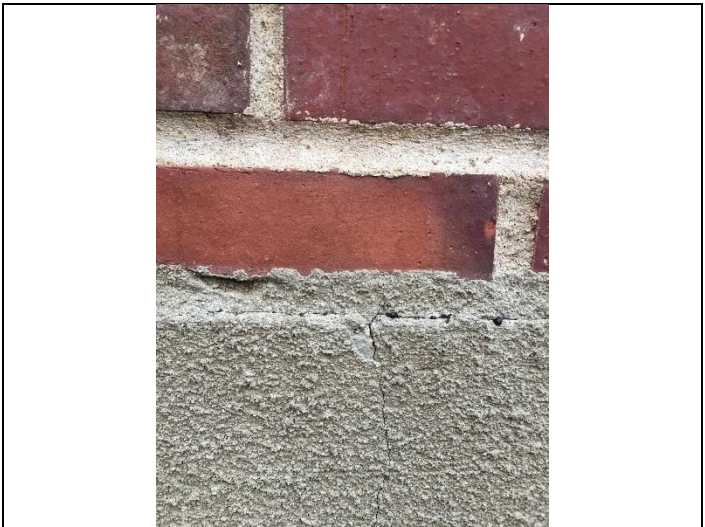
| EFIS Surfacing – Mech. Room & Entry Area
